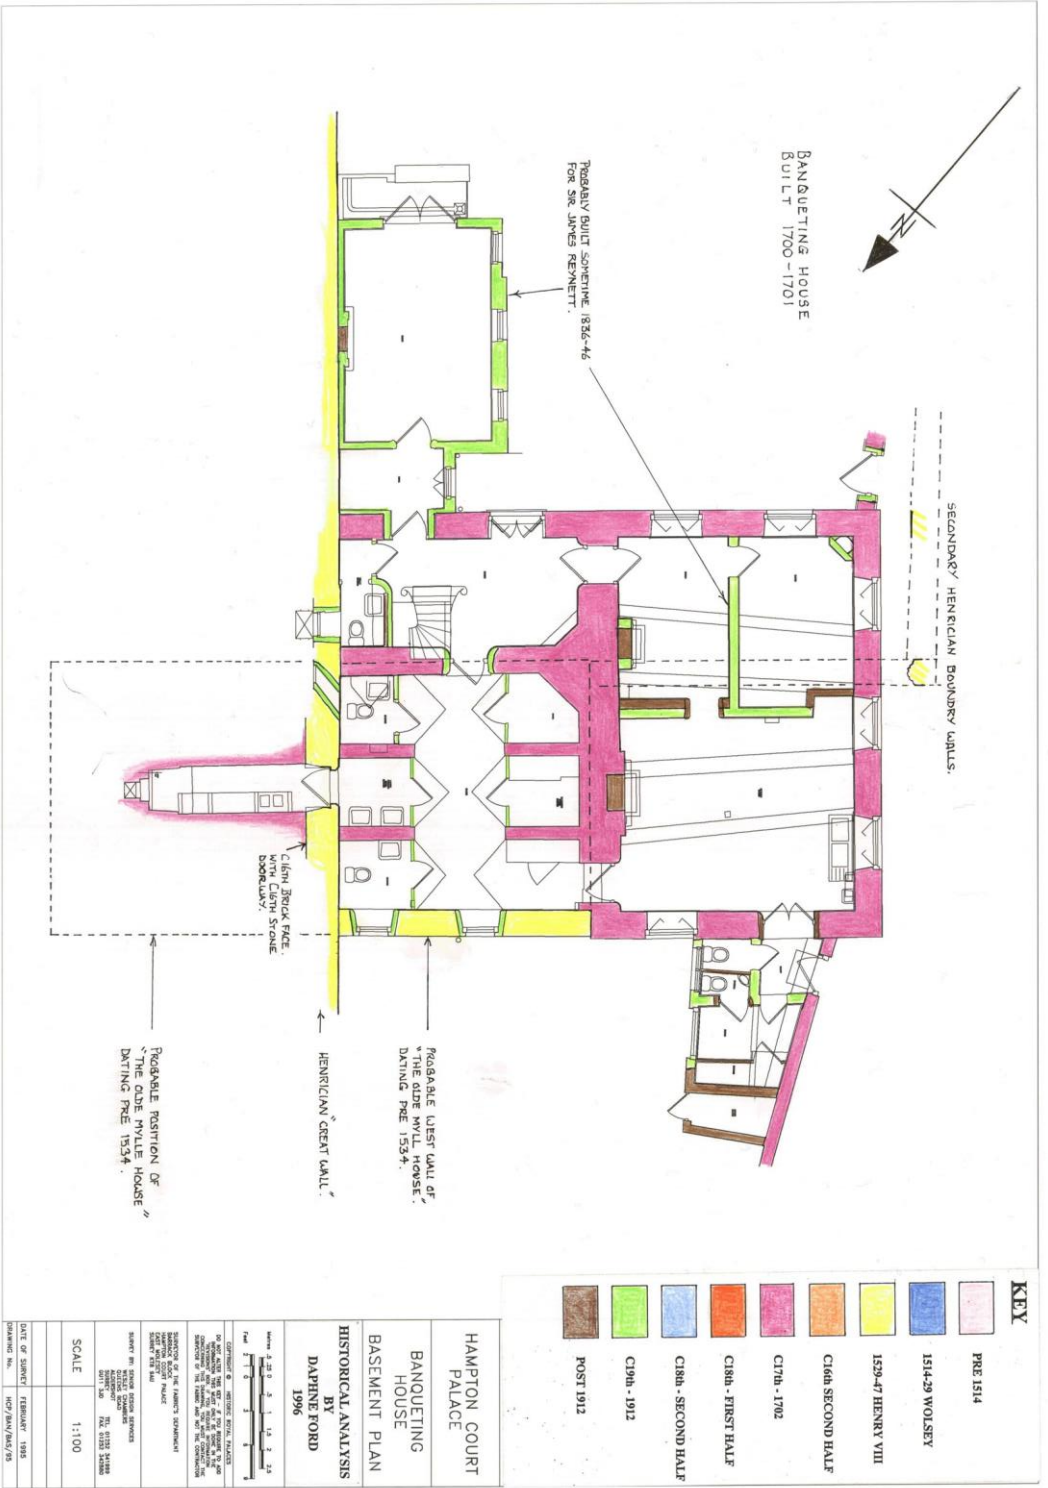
Daphne Ford's ground floor phased plan of the Banqueting House
